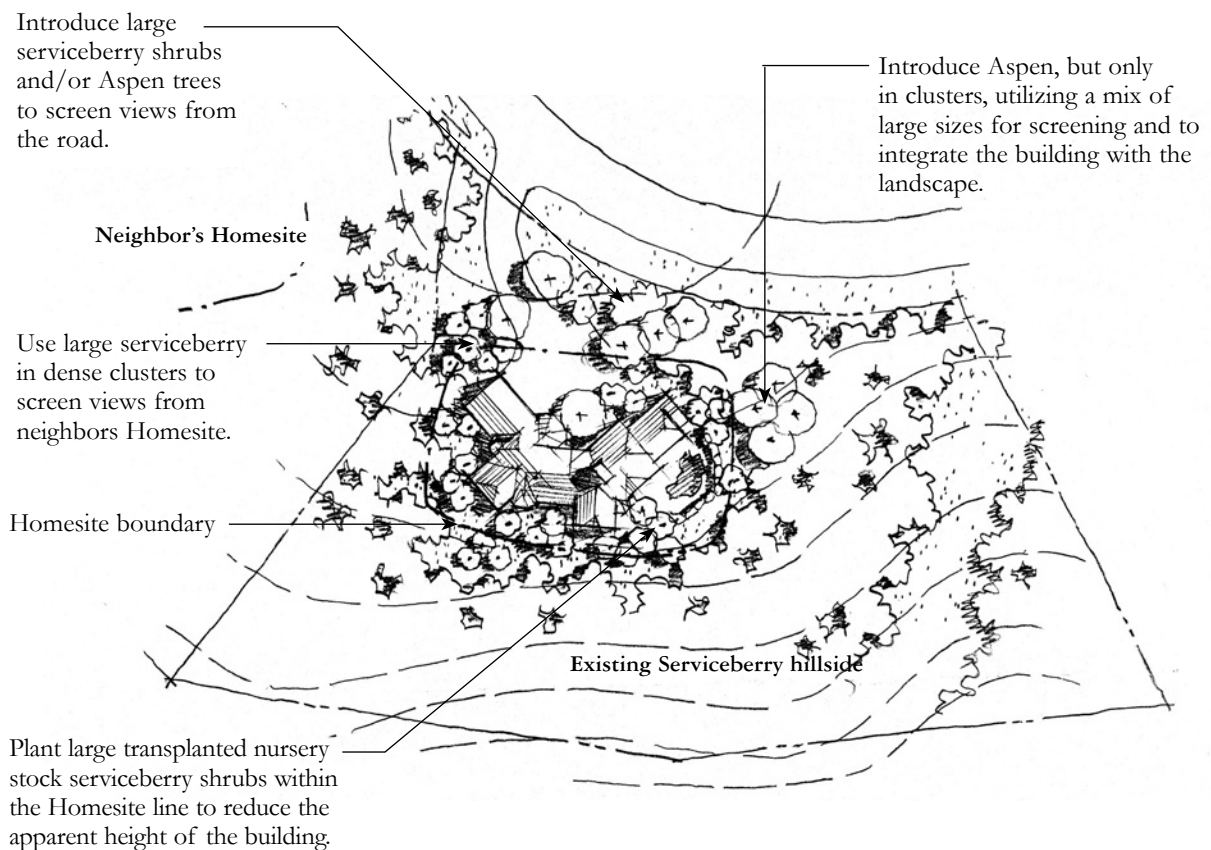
The Mountain Shrub Zone Landscape Planting Diagram
